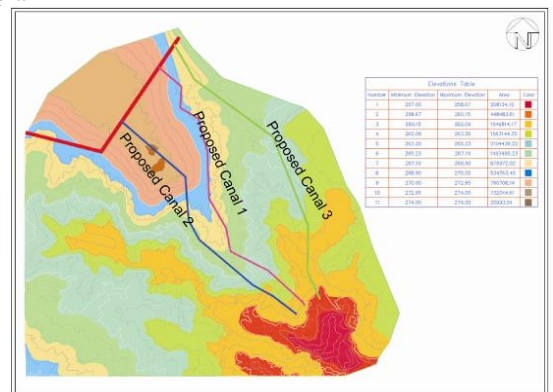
Elevation Plan of Somnala Minor Irrigation Scheme
